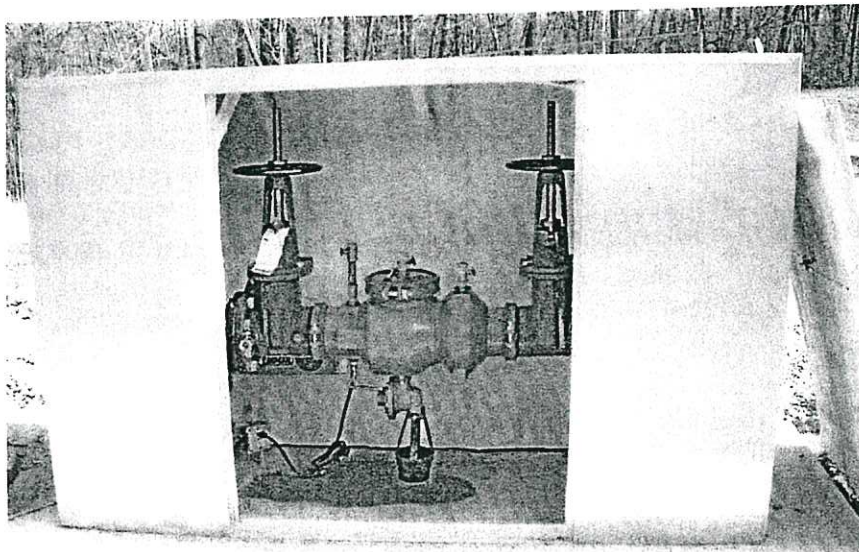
Picture of reduced pressure principle backflow prevention assembly installed in a heated enclosure. The relief valve has an air gap device attachment to prevent direct connection to the relief valve opening.
